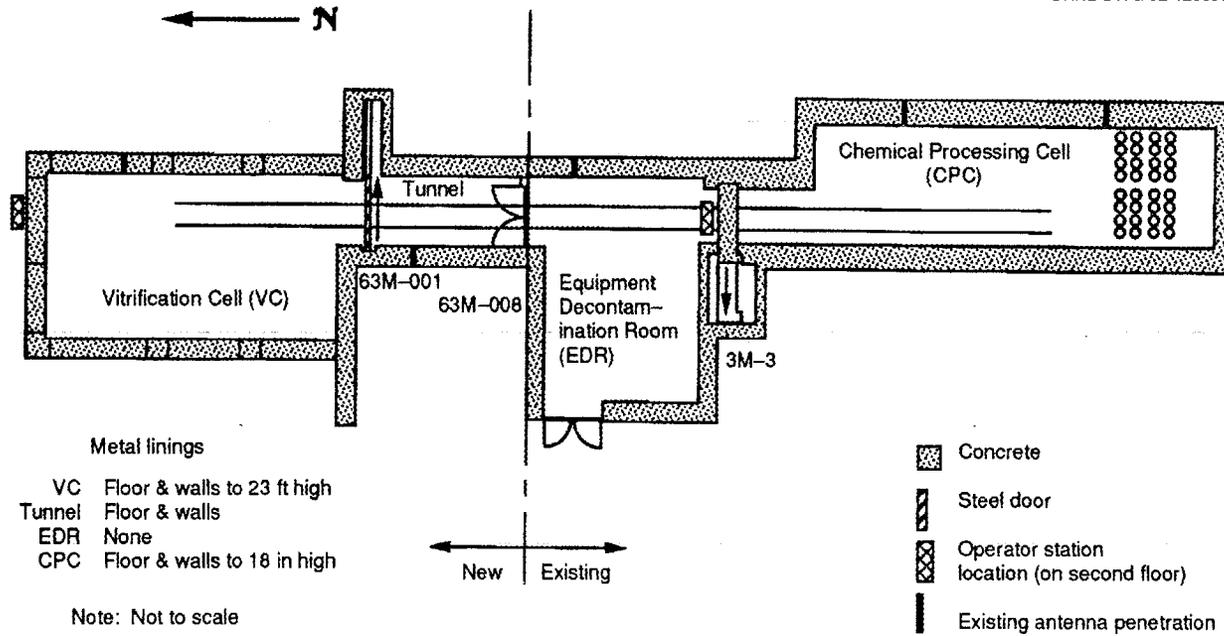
West Valley Demonstration Project transfer cart cell plan.
